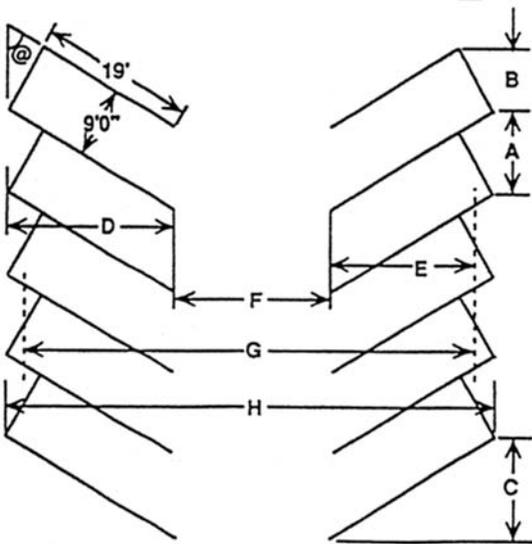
A: Layout and Dimensions for Full-Size Car
